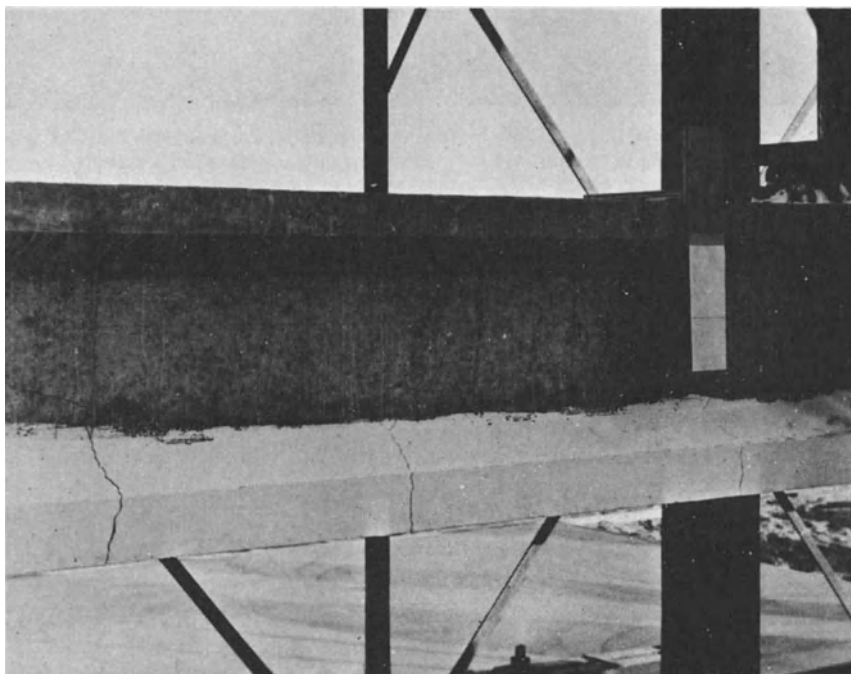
Beam with unbonded post-tensioned tendons under a load exceeding the cracking load. Note wide spacing and relatively great width of the flexural cracks in the bottom flange. (Courtesy U.S. Naval Civil Engineering Research and Evaluation Laboratory, Port Hueneme, California.)
